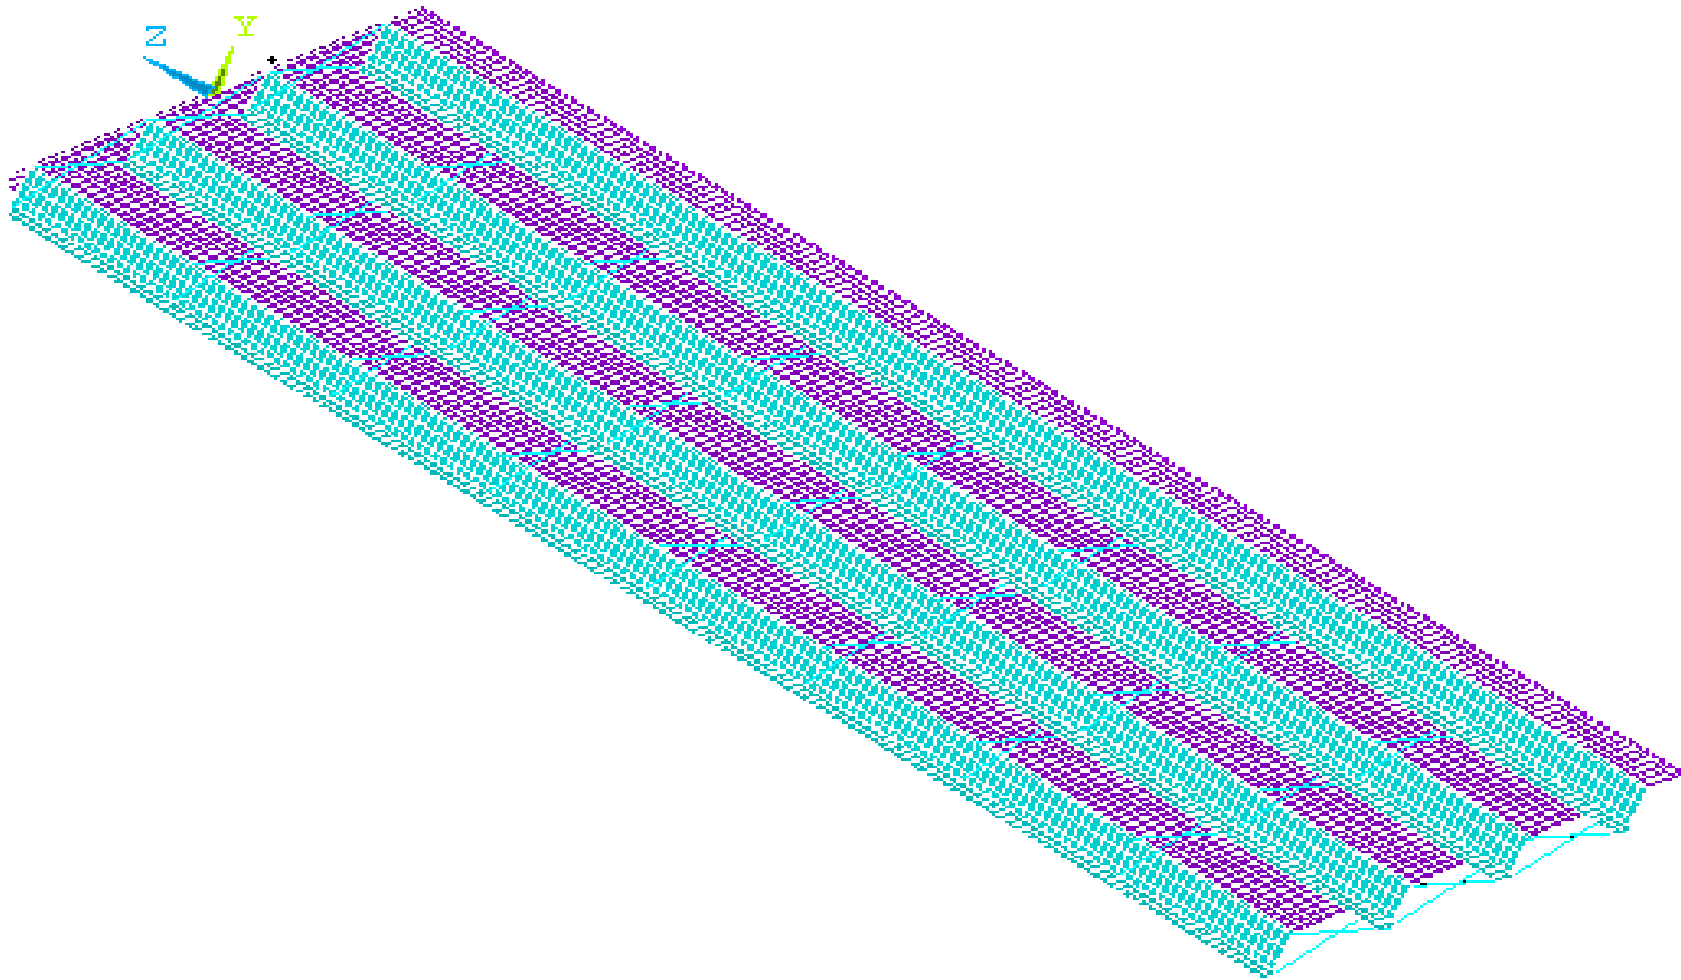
Finite element model for 40 m span with 4 girders at 4.5m spacing
